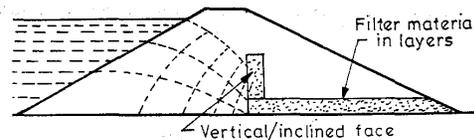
(d). 'Chimney Drain' in Stratified Embankments.
